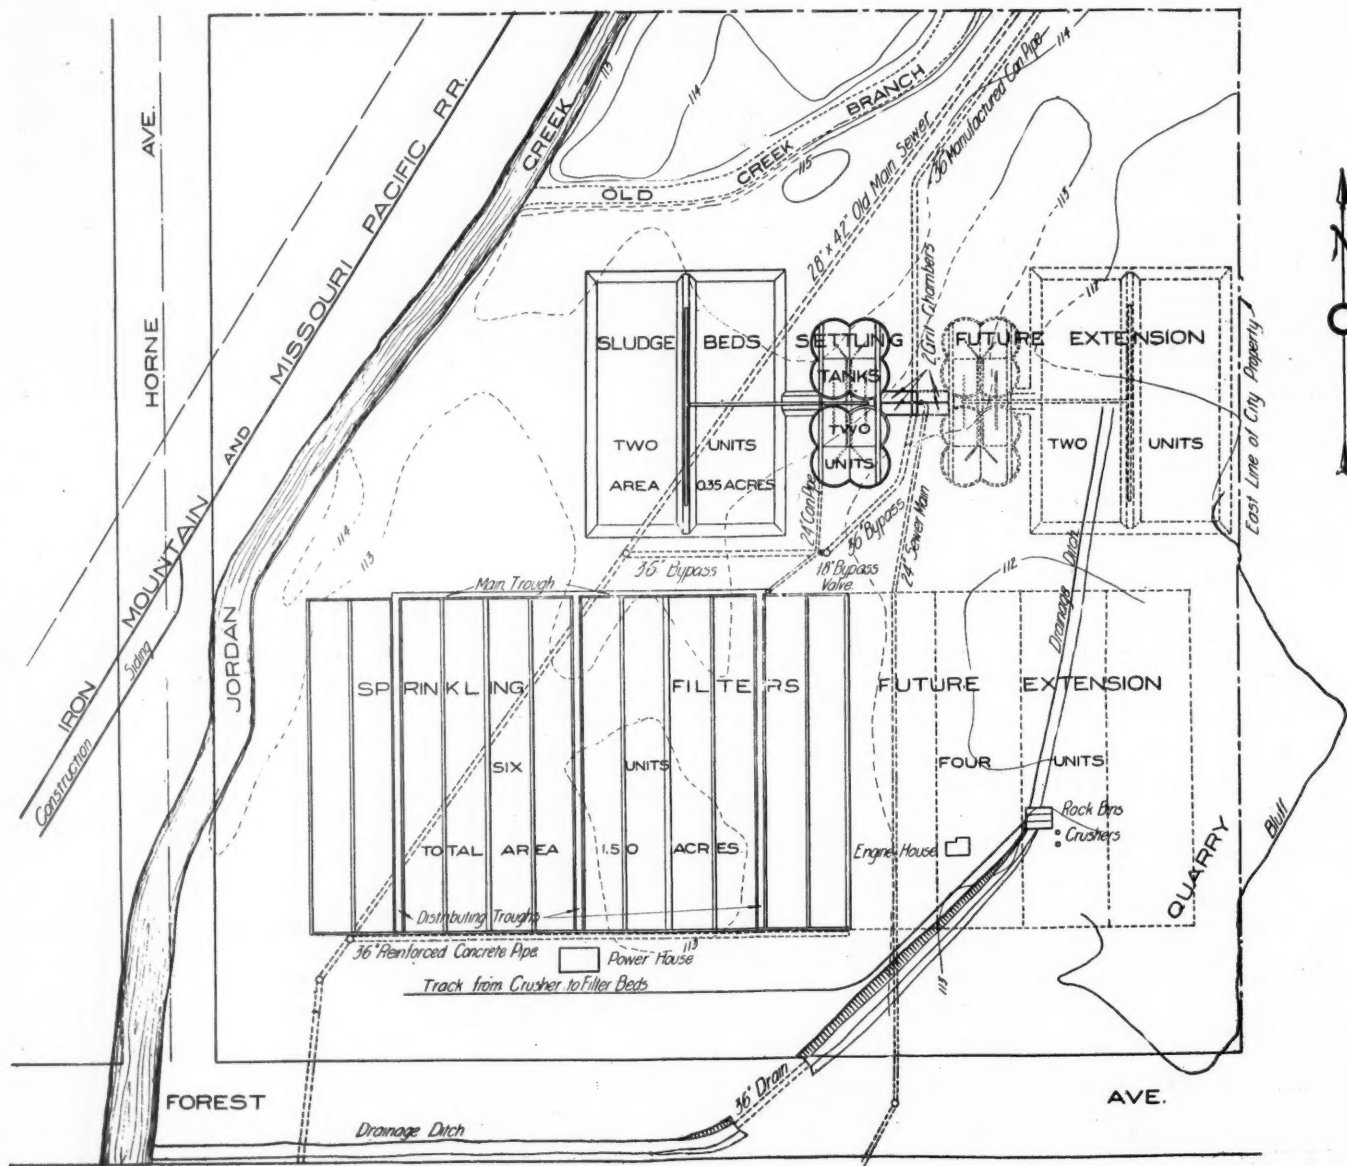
LOCATION PLAN OF SOUTHERN SEWAGE DISPOSAL PLANT.
